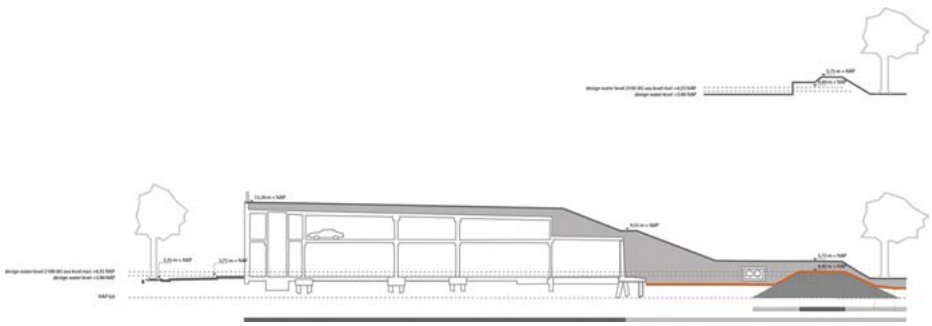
Cross-section of the 'Roof Park' Rotterdam
